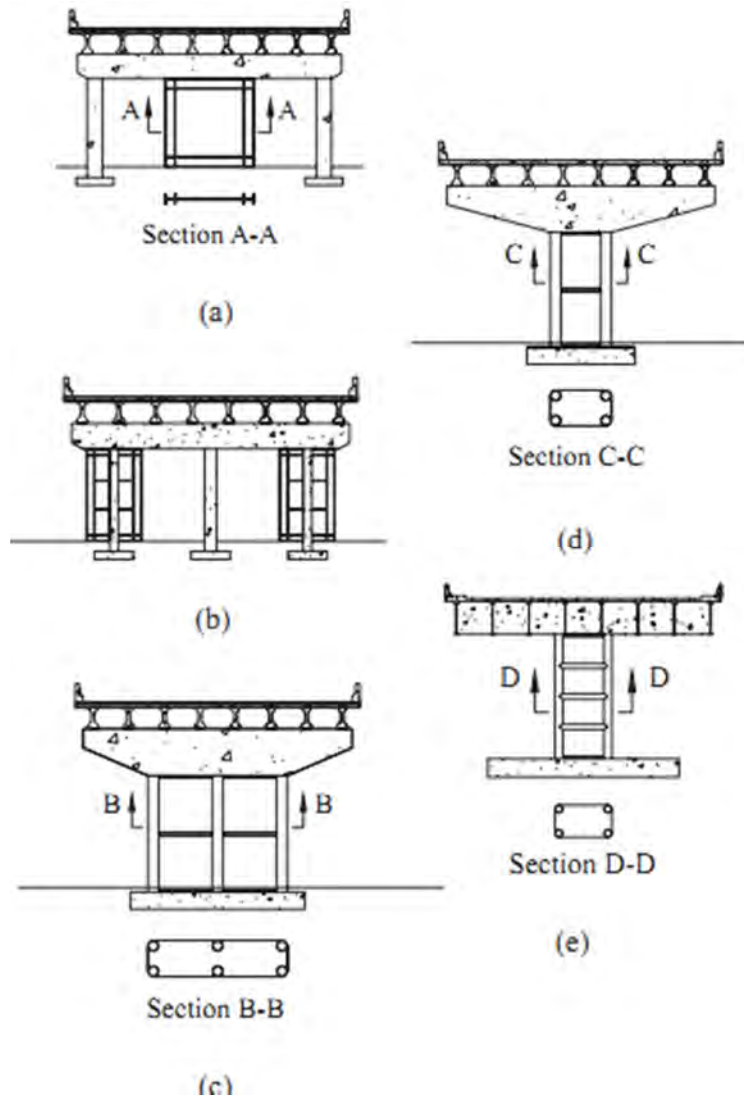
Multi-hazard Resistant SPSWs Bridge Pier Concept (Keller D., Bruneau M., 2009)
